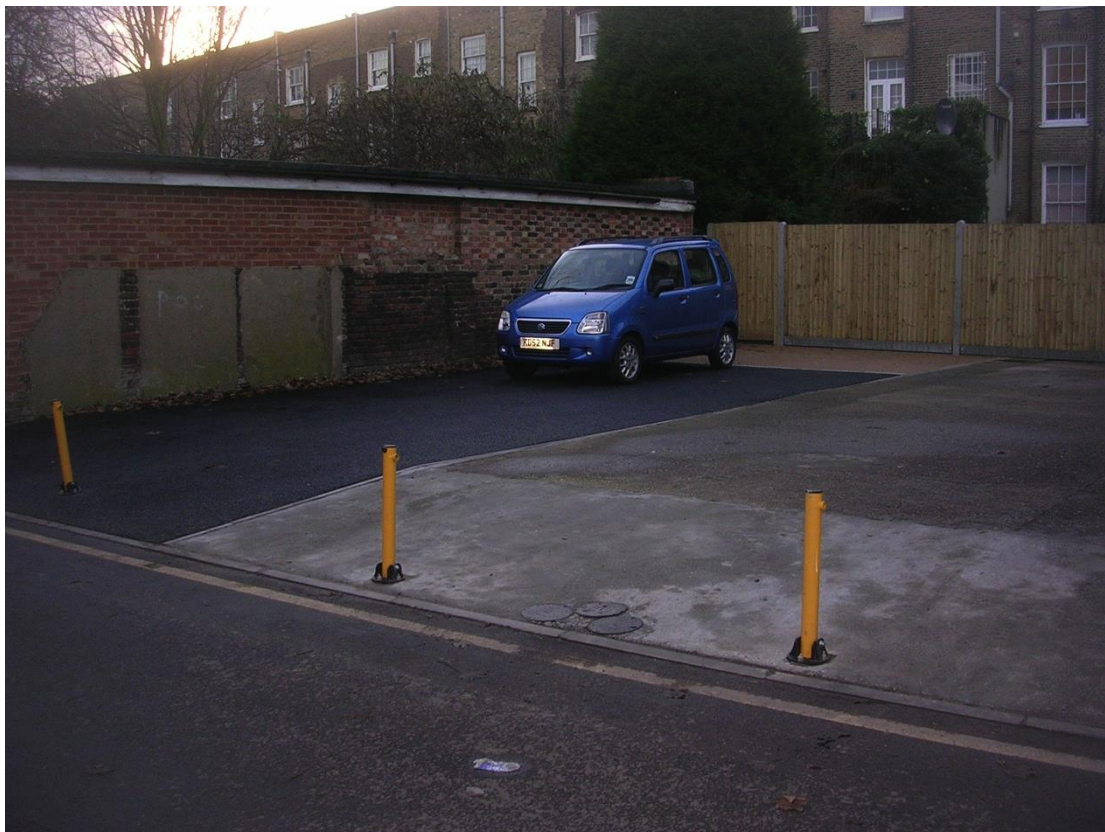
19th century garden wall with 20th century brickwork above improved parking area and recent fencing to dustbin compound (Photo: LB Enfield Dec 2013)
